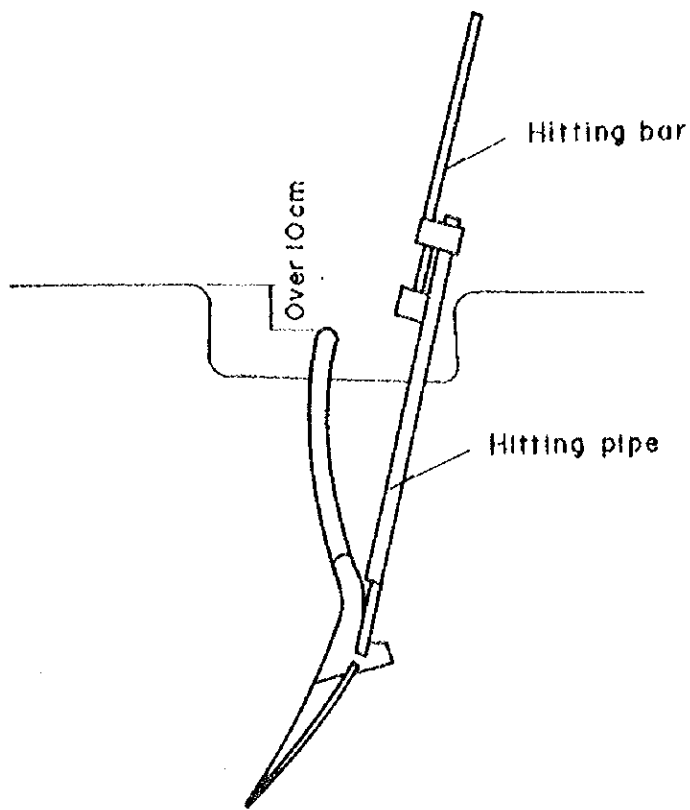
Installation of Stay Anchor (2/4)
